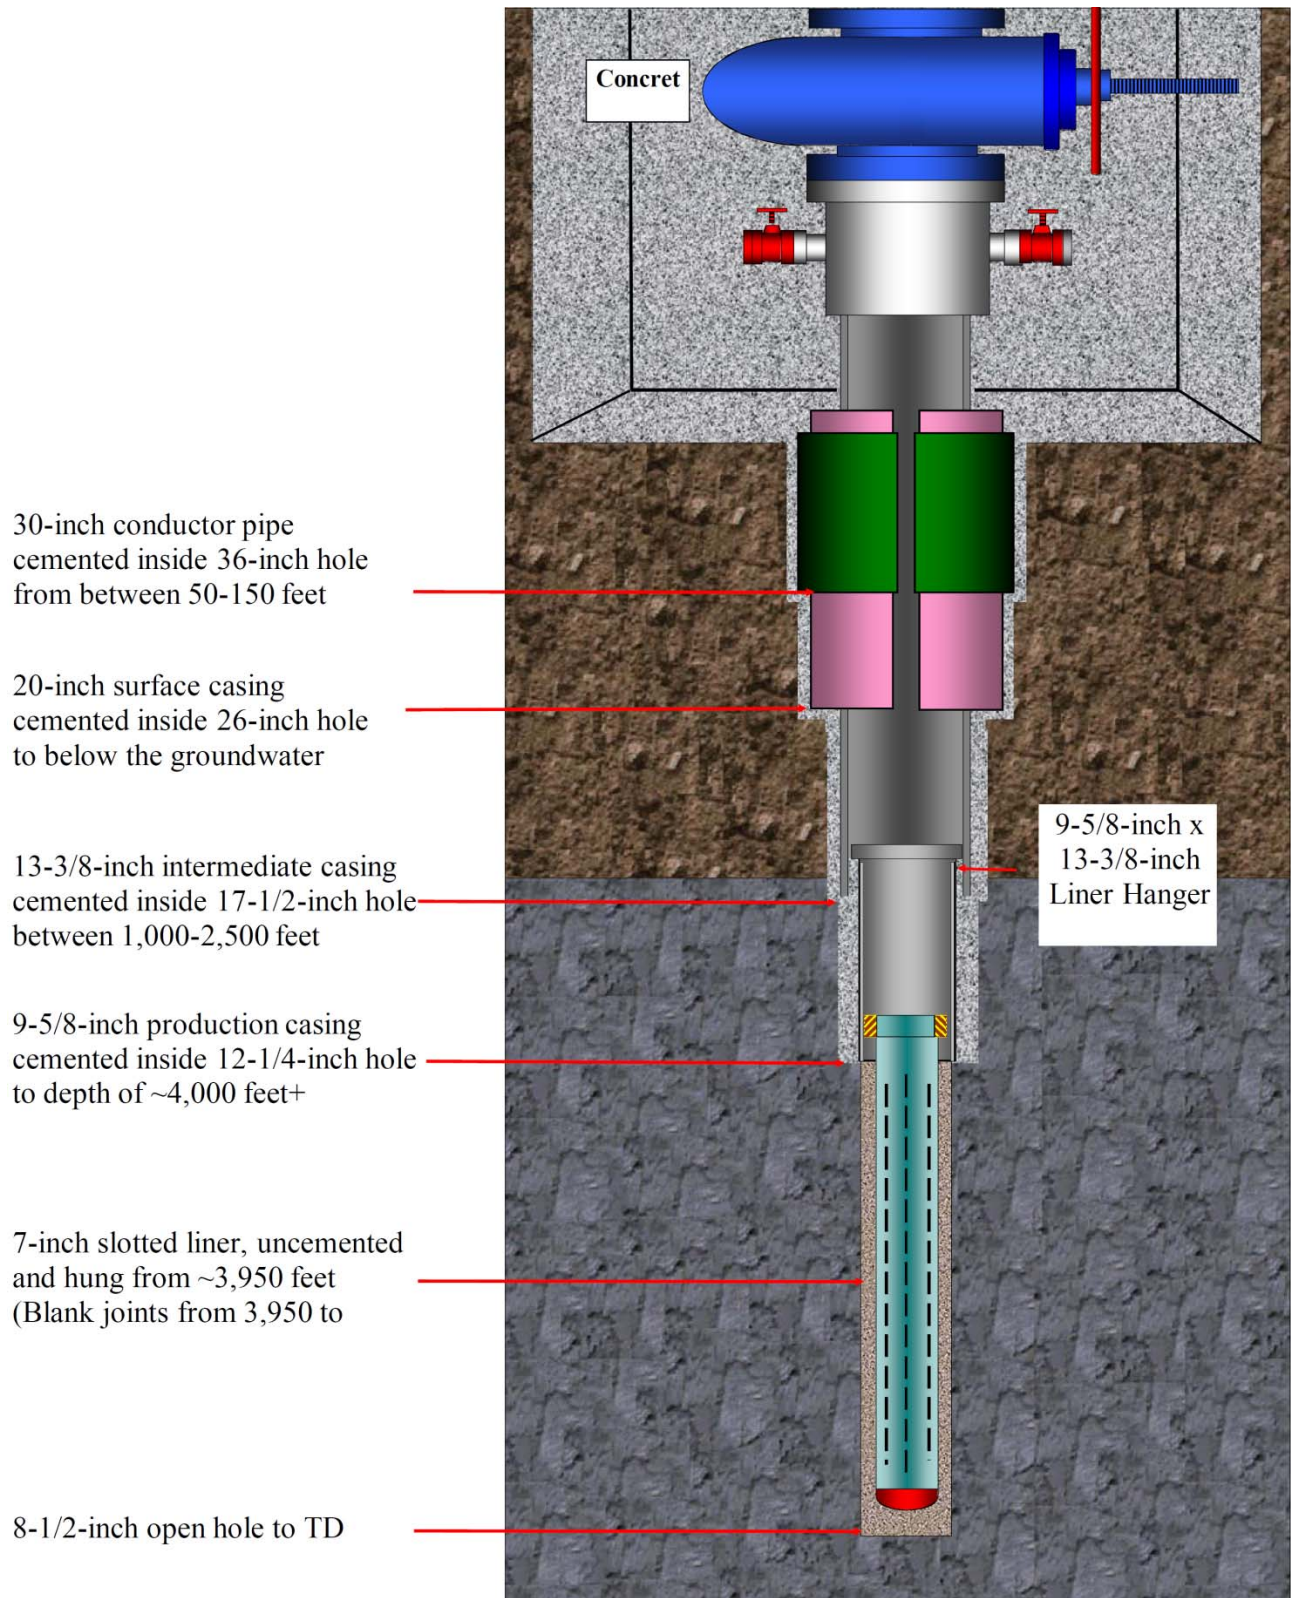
Typical geothermal casing profile (GeothermEx).
